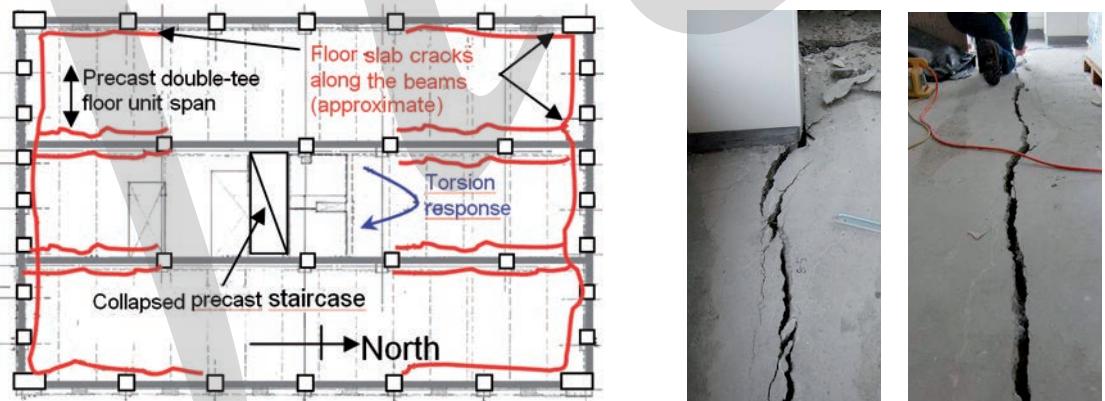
Extensive damage to floor diaphragm and loss of floor support in ductile RC multi-storey frame building caused by beam-elongation effect during Christchurch earthquake of 22 February 2011 (Pampanin et al., 2012; Kam et al., 2011)
